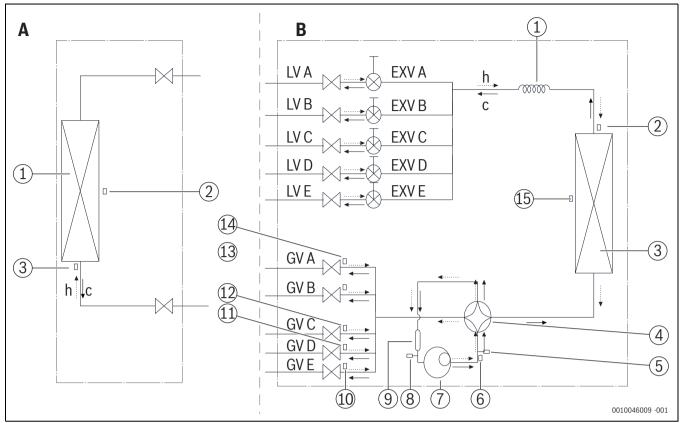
Refrigeration circuit drawing of inverter 1 drive 5 type
